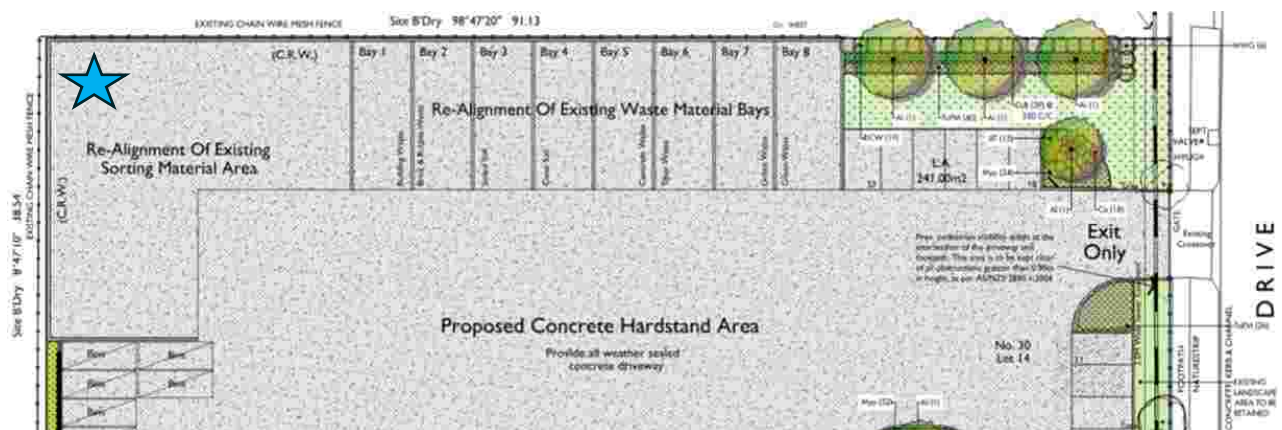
Extract from plan endorsed under Planning Permit T170112 Proposed ADP shown by star
